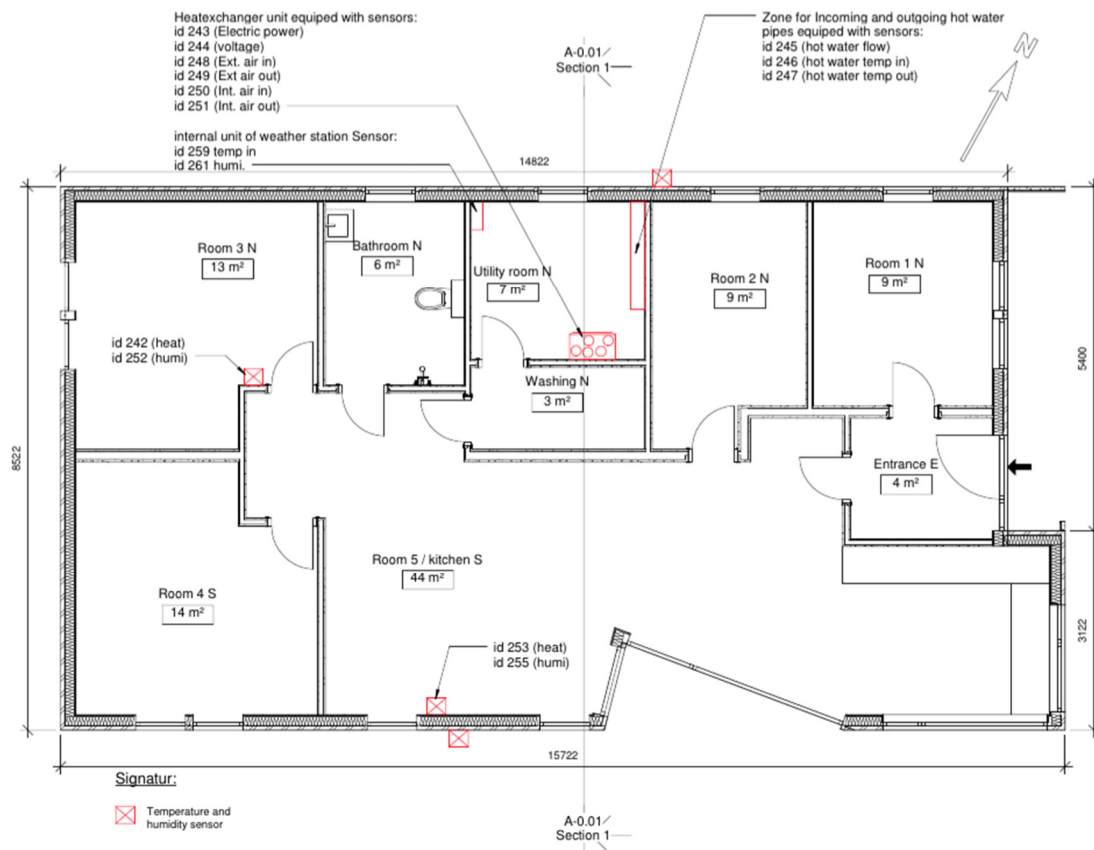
Plan layout from the Revit 3D model illustrating sensor placing
